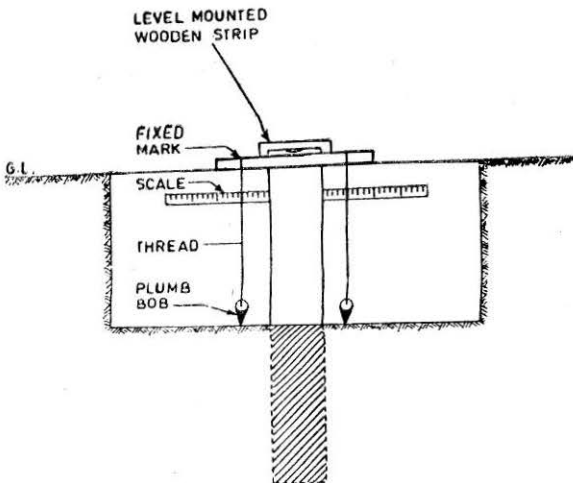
Measurement of wall thickness with scale and plumb bob arrangements
